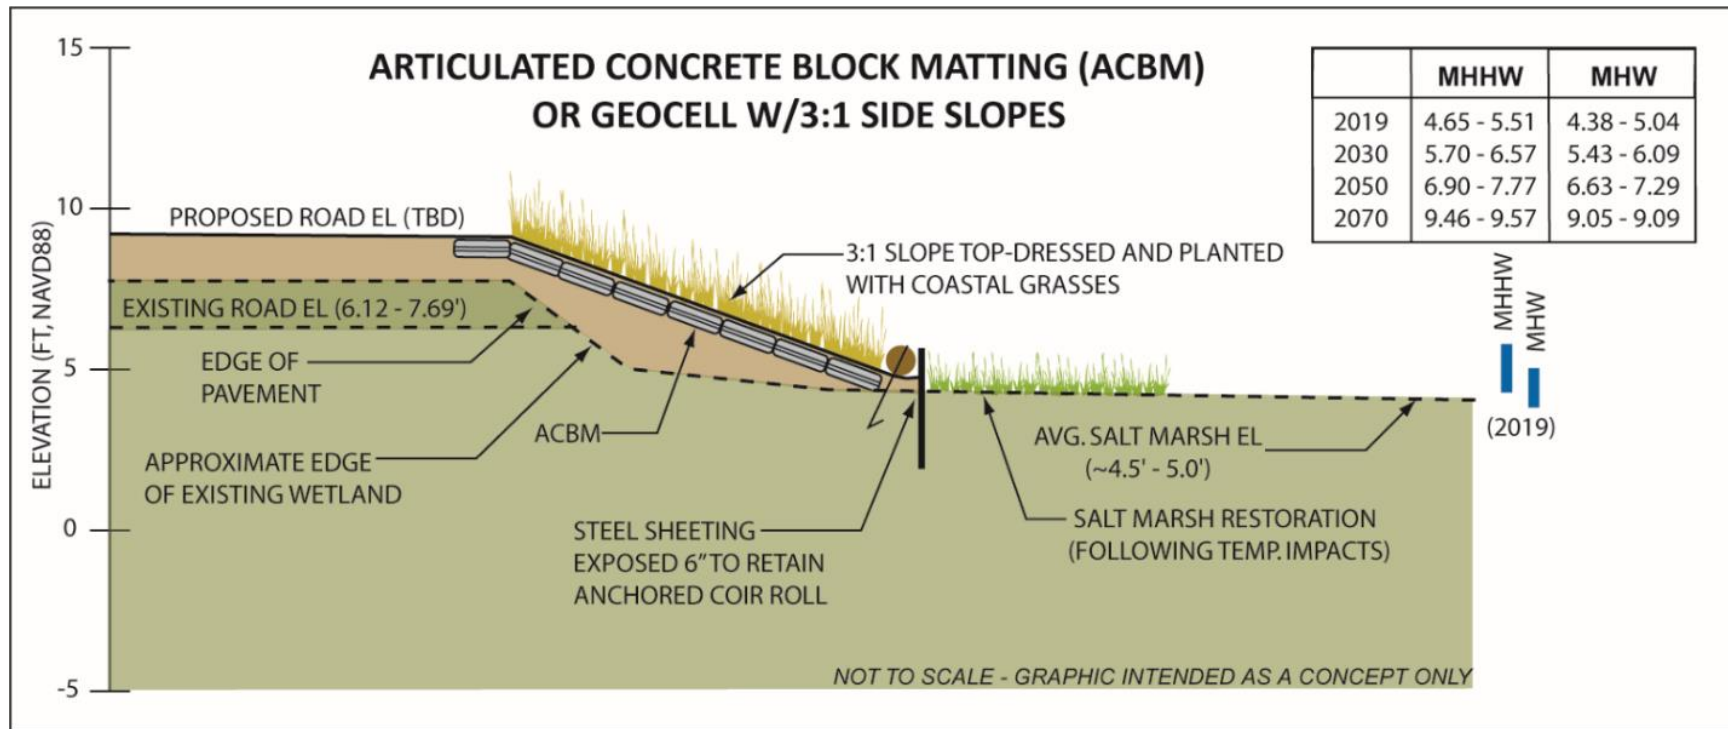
Raised roadway and ACBM-geocell alternative installed at 3:1.
